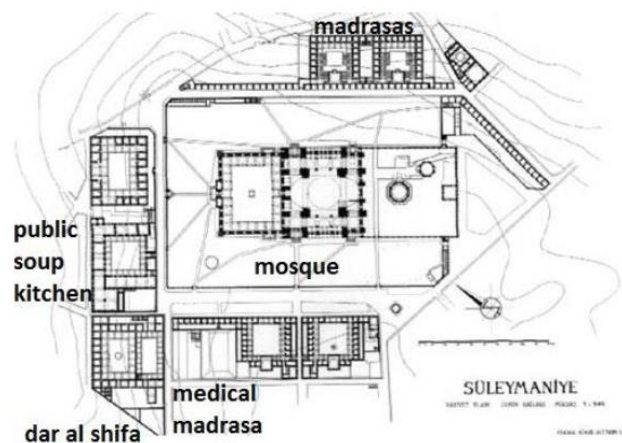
Ground Floor Plan, Süleymaniye Complex
